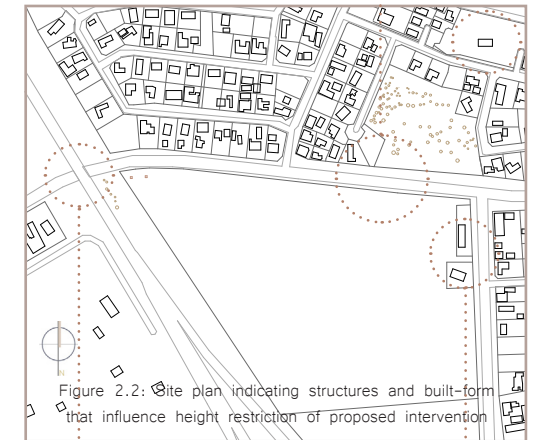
Site plan indicating structures and built-form that influence height restriction of proposed intervention
